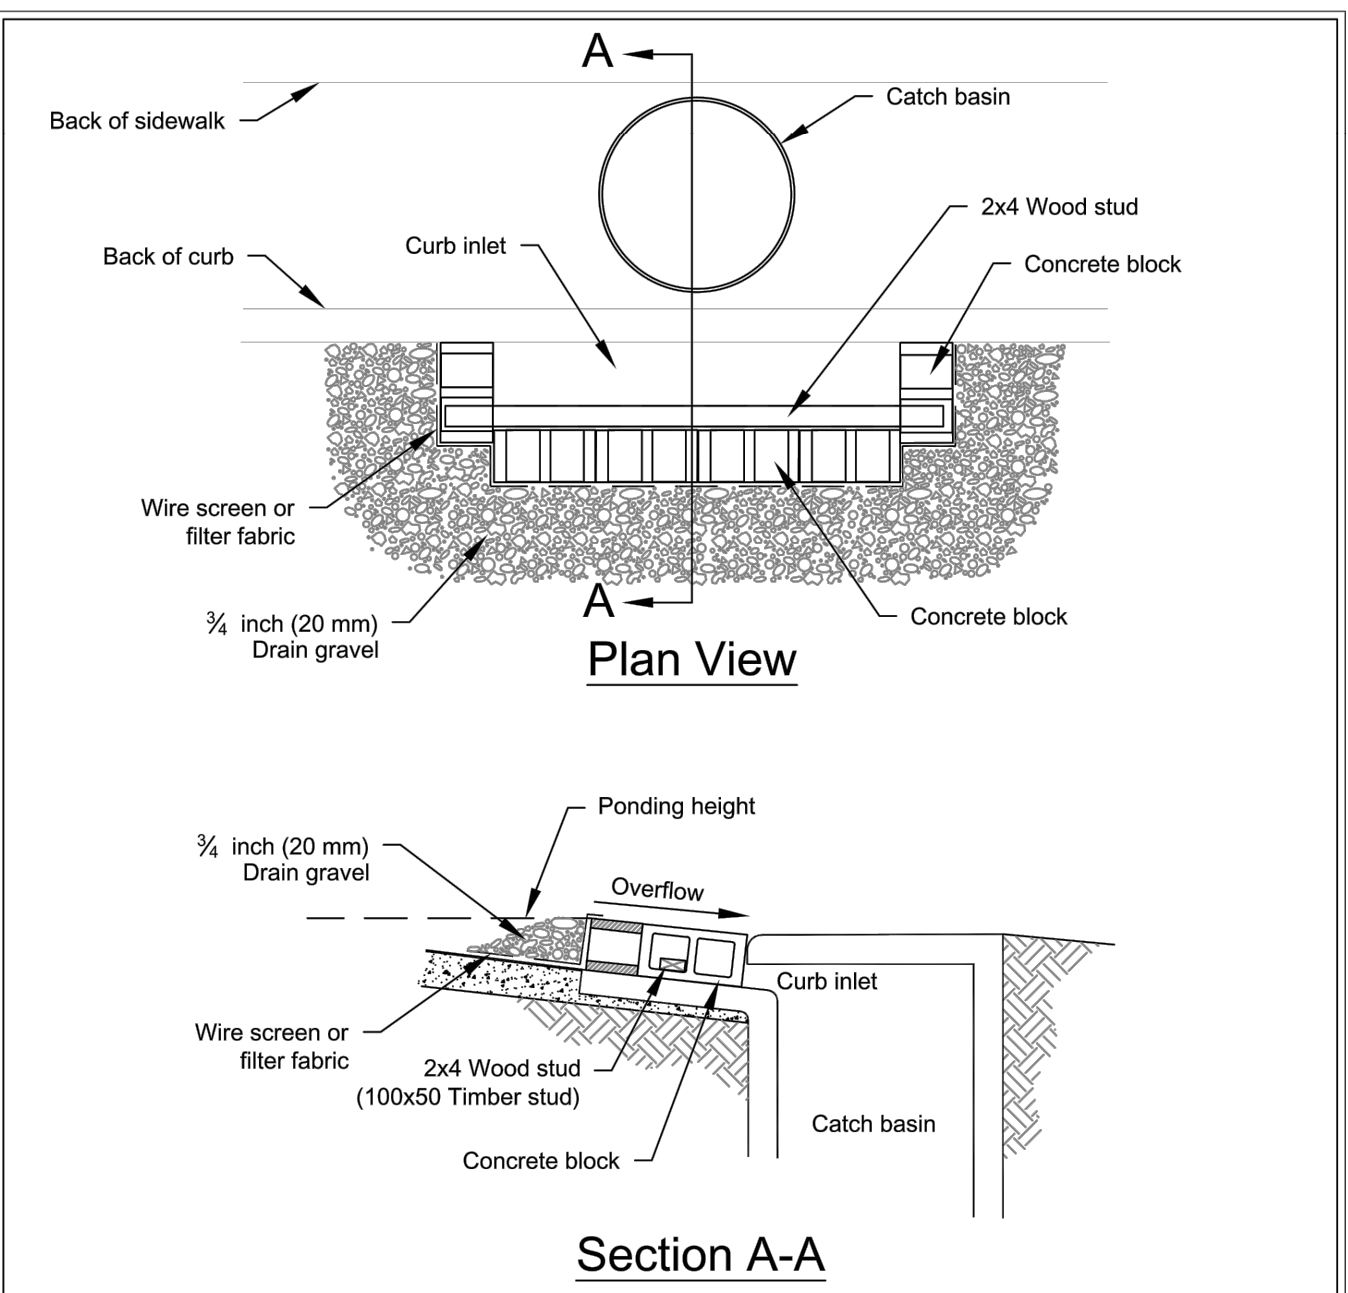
Block and Gravel Curb Inlet Protection
